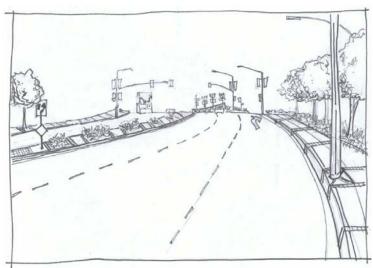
Existing Condition: McKee Road heading west, toward 101
